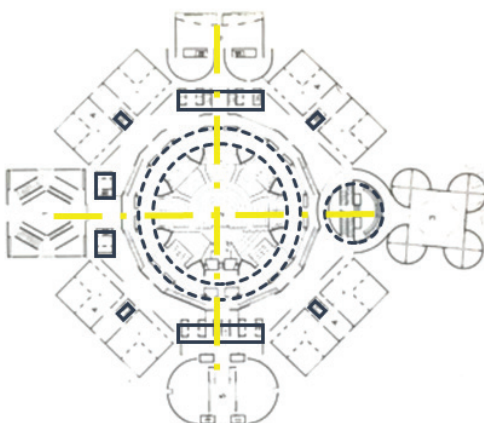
Floor plan, Centro Governmental Dacca, Bangladesh (1962|1983) (Saraiva, 2011, p. 189)
